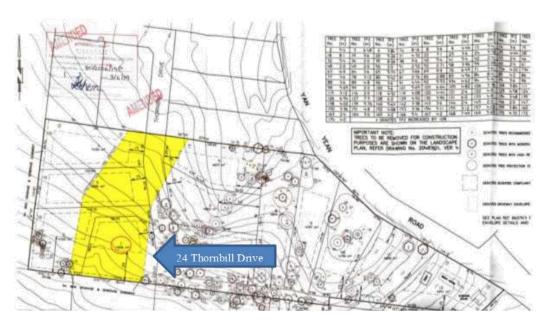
Plan showing location and building envelope of 24 Thornbill Drive
